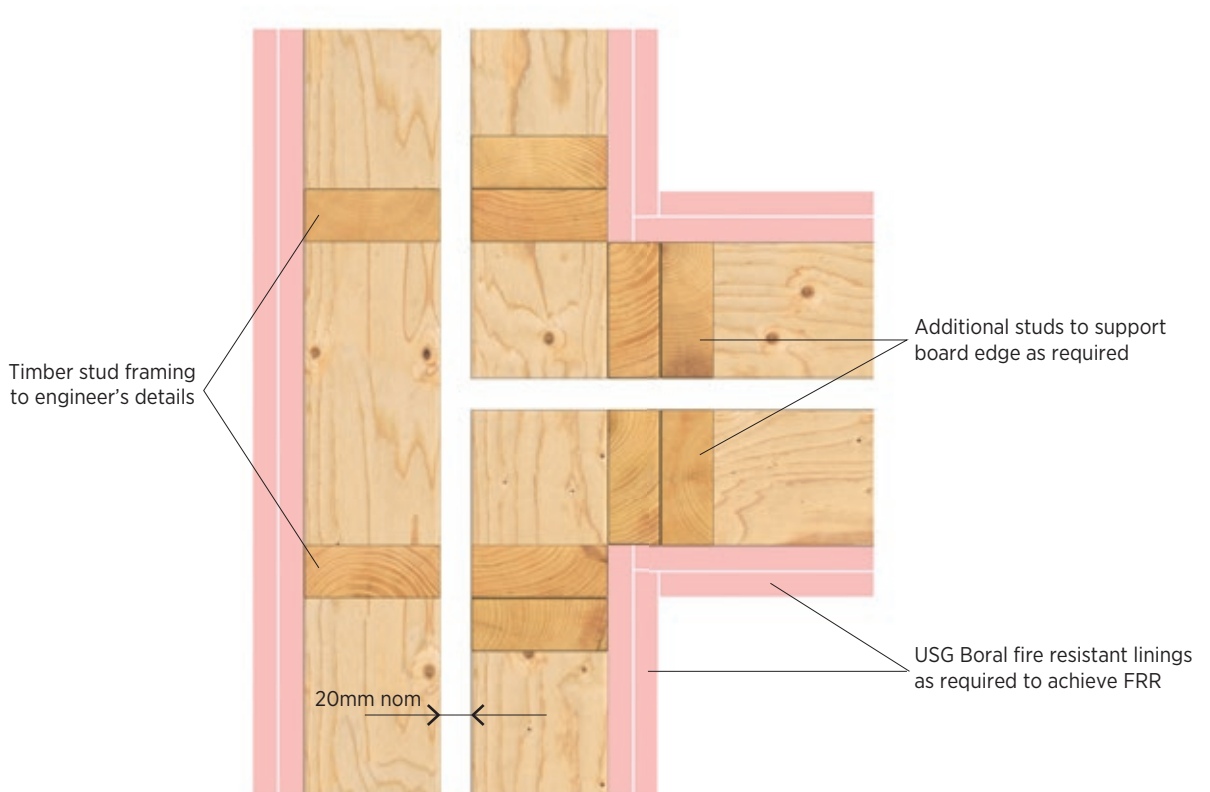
Twin Timber Stud Wall - T Junction Detail
